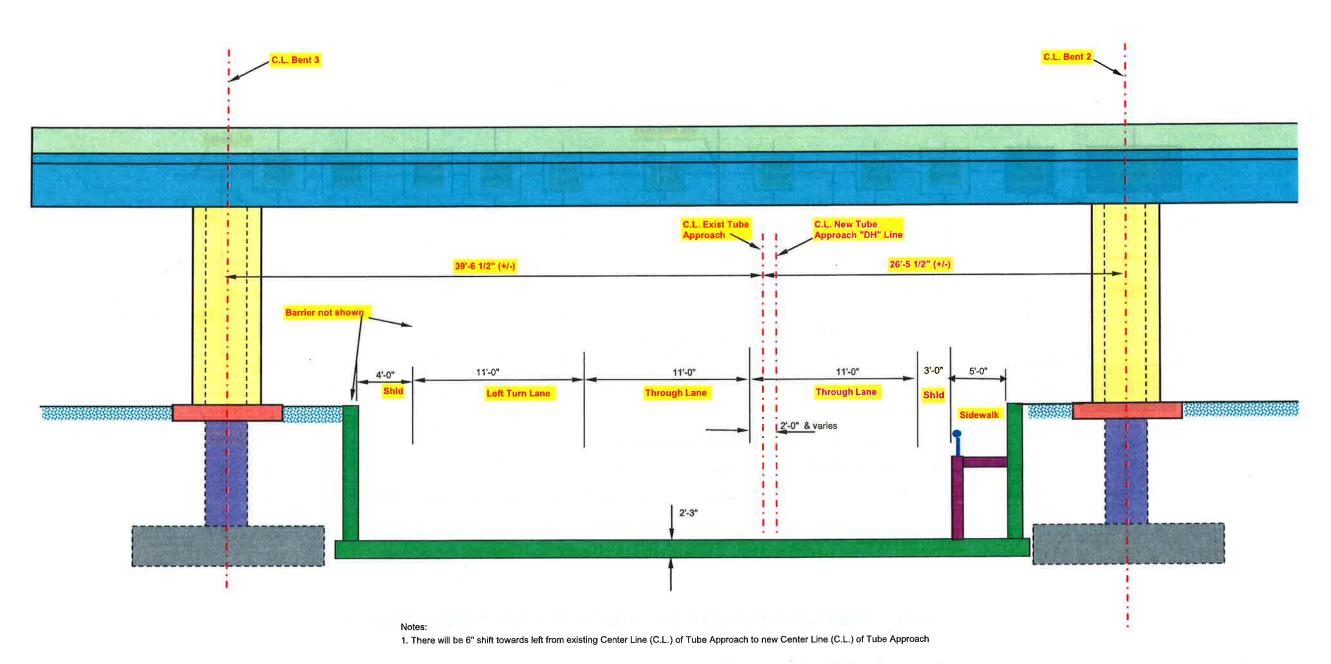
Typical Section - Depressed & Widened New Tube Approach
